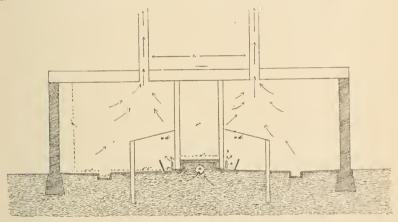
End section of a cattle stable, showing floor, elevated feeding alley and system of ventilation.
